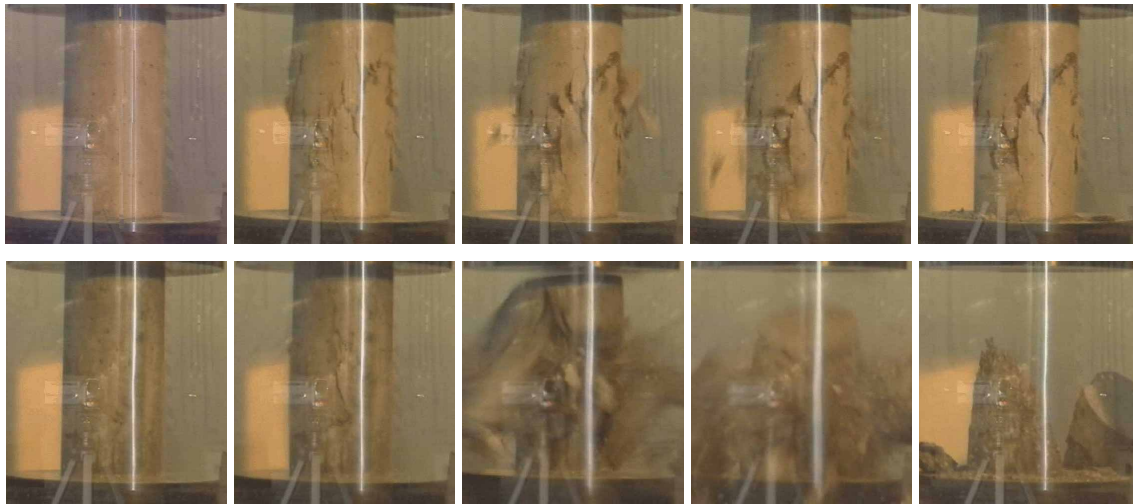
Comparison of the compression failure of H50 and H100 concrete cylinders
